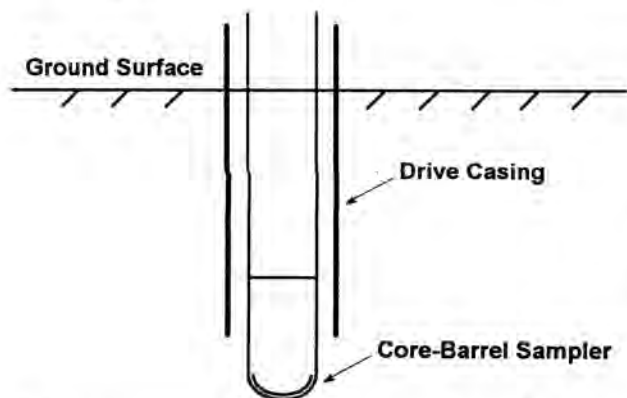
Cross-section of drive casing & core-barrel sampler.
